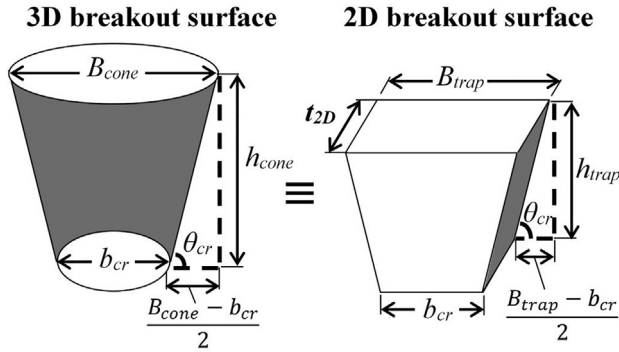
Equivalent concrete breakout shapes in 3D and 2D models.
